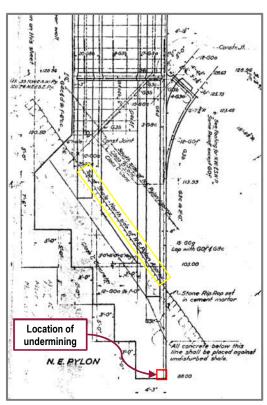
East Pylon left column footing detail (taken from the original design drawings).
